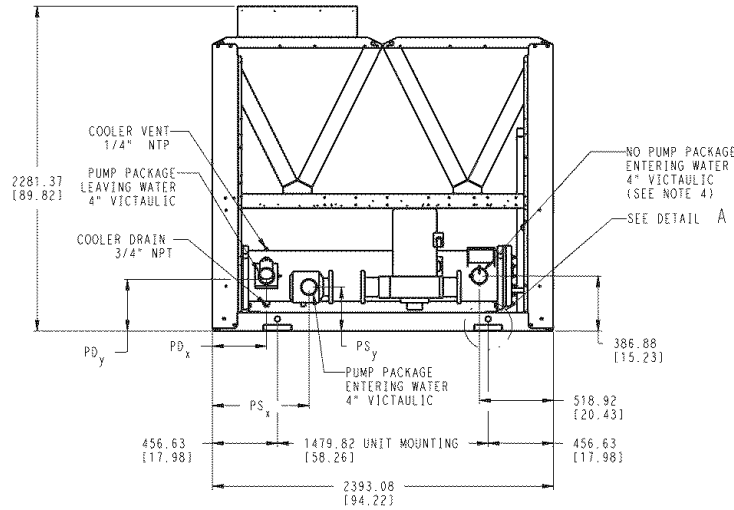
30RB060, 070 Air-Cooled Chiller Dimensions
